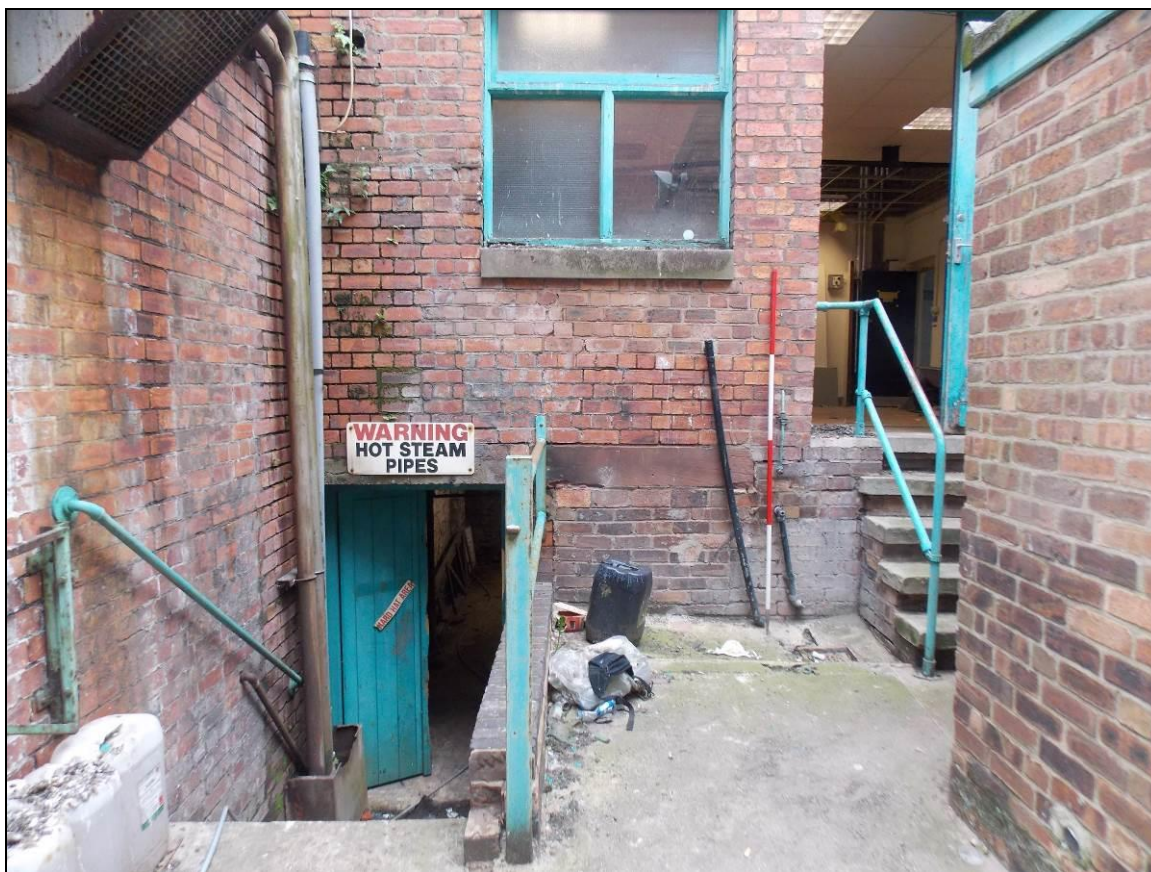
East elevation with doorways to a cellar and a laundry room, looking west (scale 2m).
